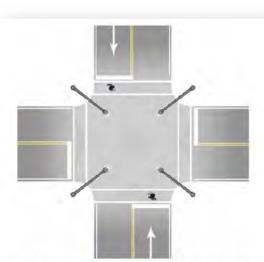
Drawing. New design for intersection lighting layout for crosswalks.
